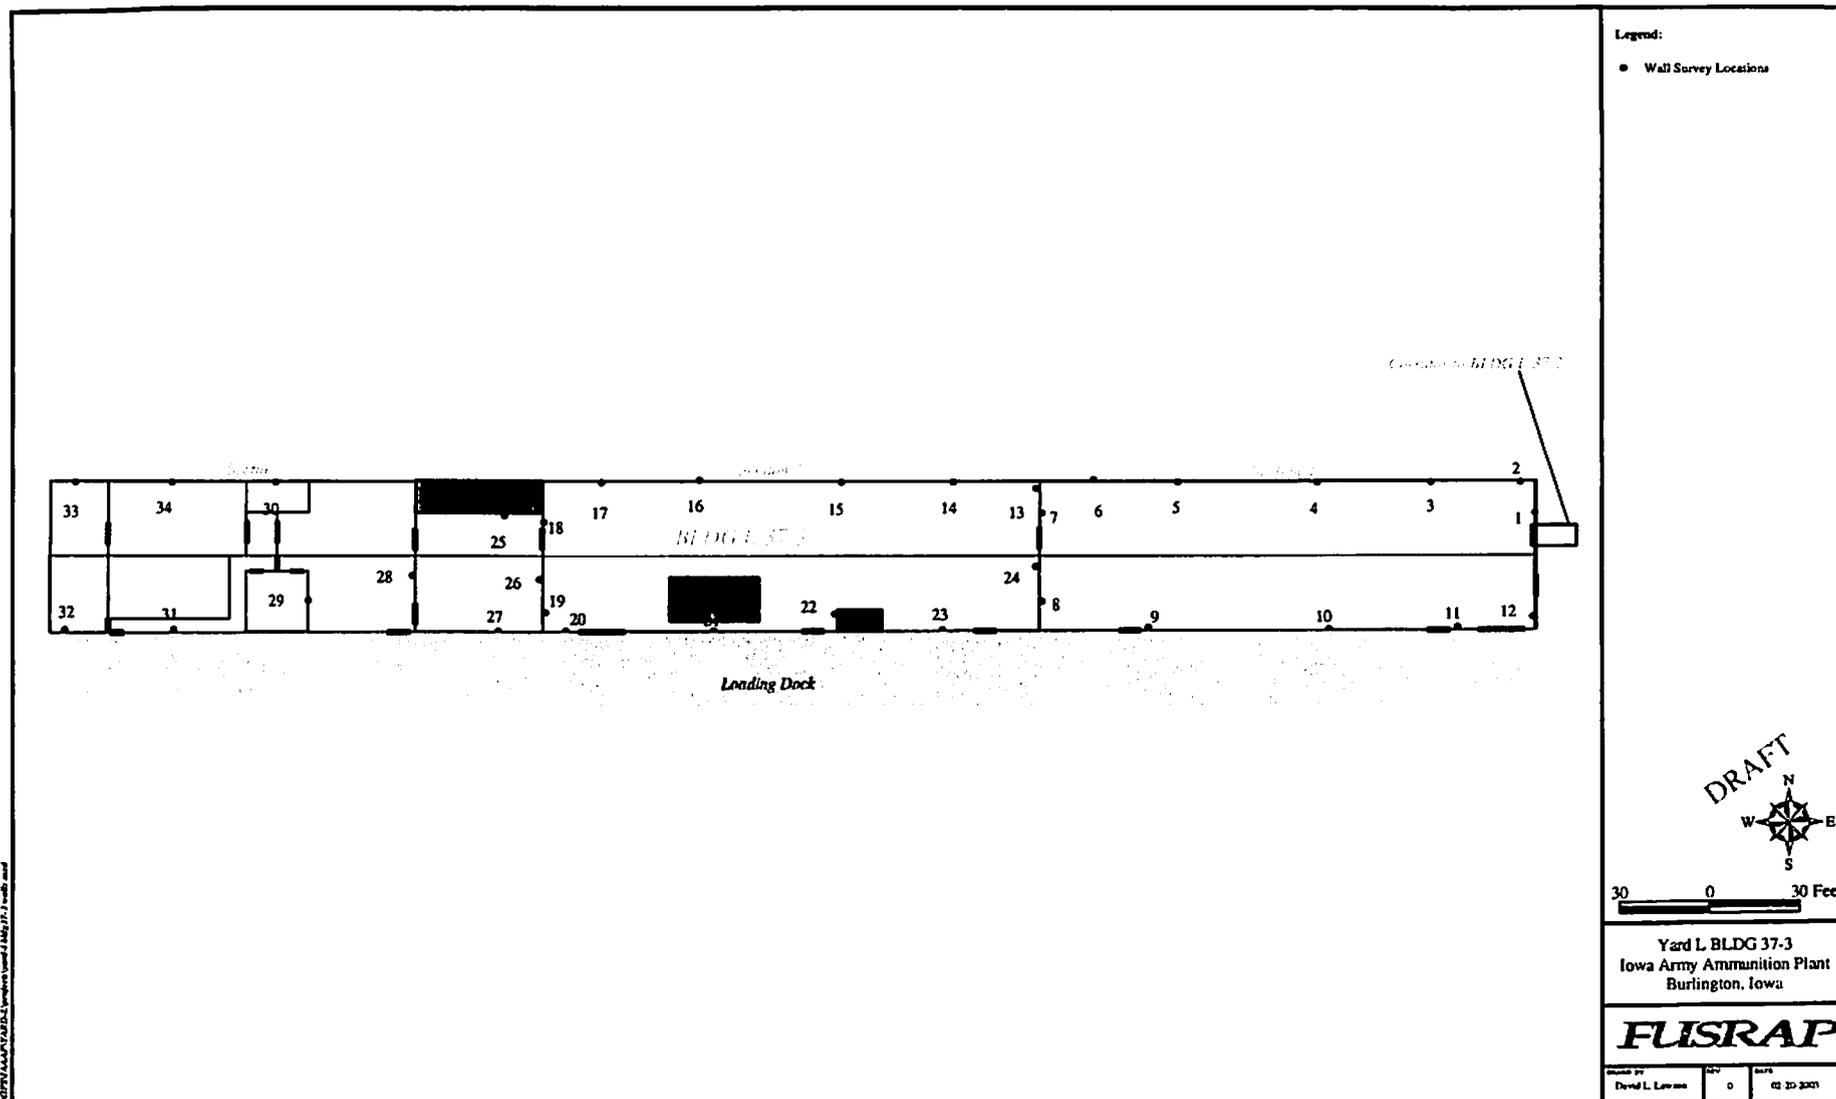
IAAAP Yard-L Building 37-3 Wall Survey Locations
